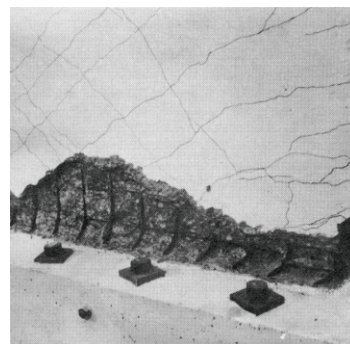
Sliding shear failure at wall's base (Paulay et al. 1982)
